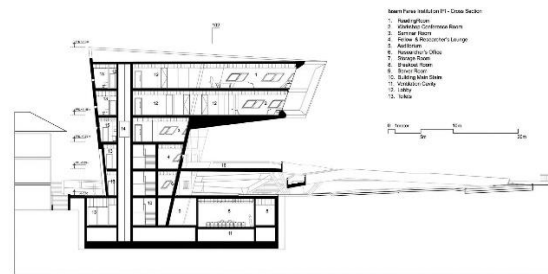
a sectional drawing showing the cantilever arm and the load above it
